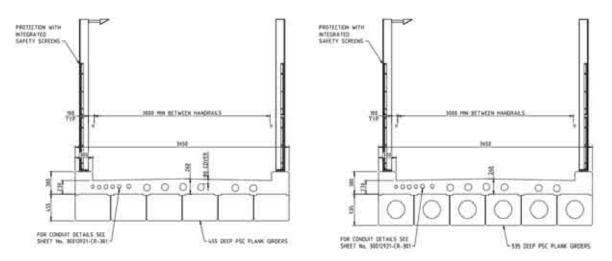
a) LEFT: Cross section of superstructure over Down main (455mm deep planks), b) RIGHT: Cross section of superstructure over Up main (535mm deep planks)
